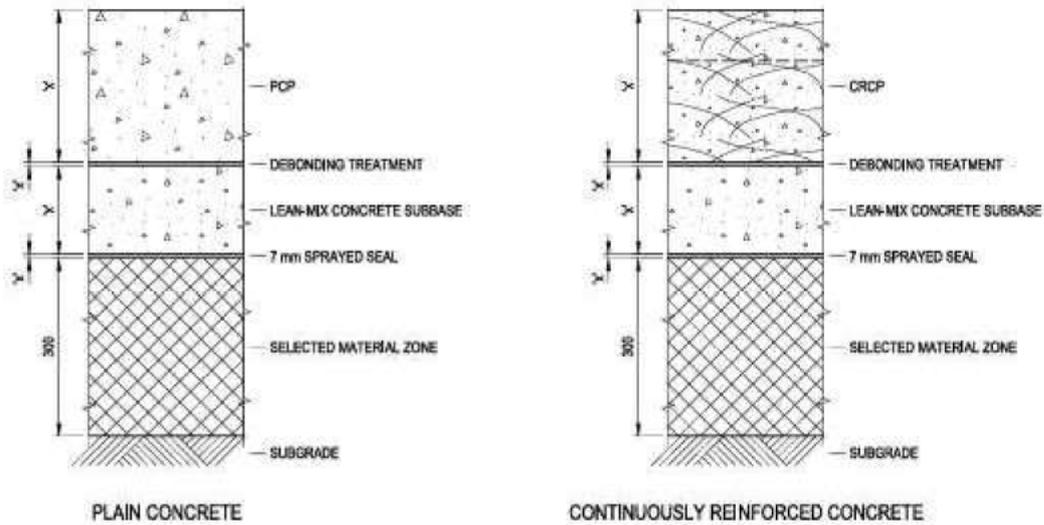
Typical pavement profile of a full depth rigid concrete pavement with and without reinforcing steel (Source: TfNSW, 2021)
